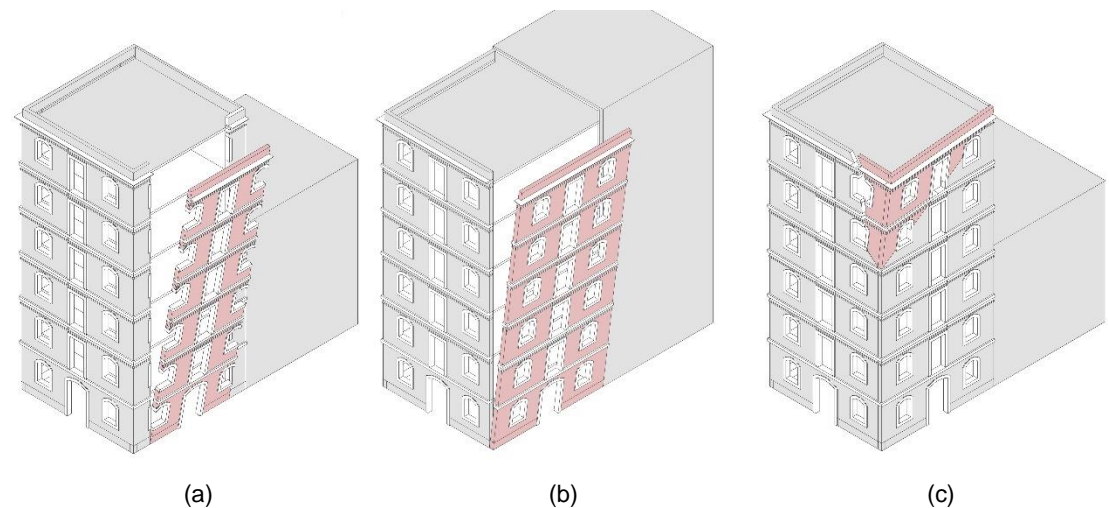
Local mechanisms: (a) Vertical strip overturning in the front facade, (b) Overturning of the side facade, (c) Failure of the corner
